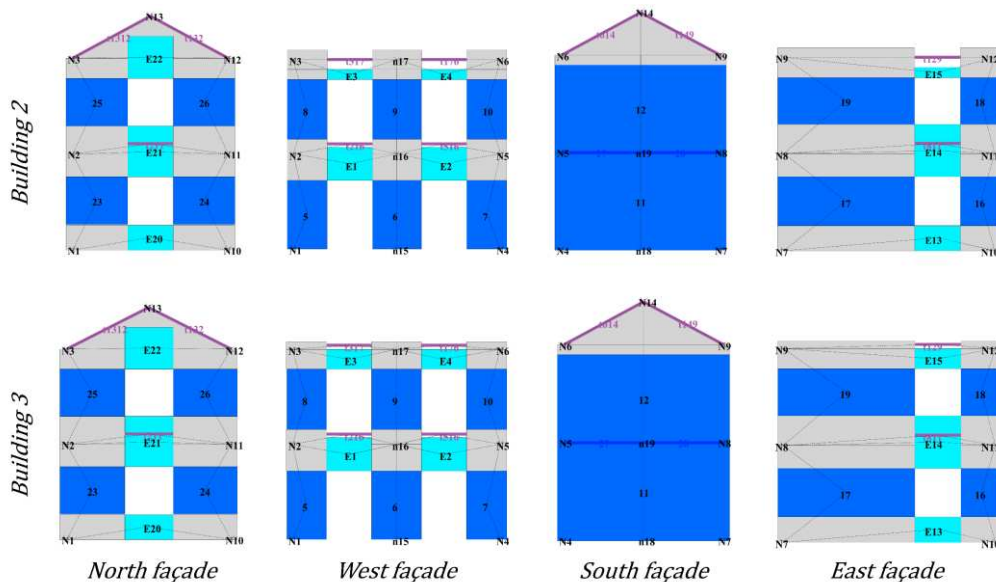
Geometrical discretization of walls in Building 2 and Building 3 models.
